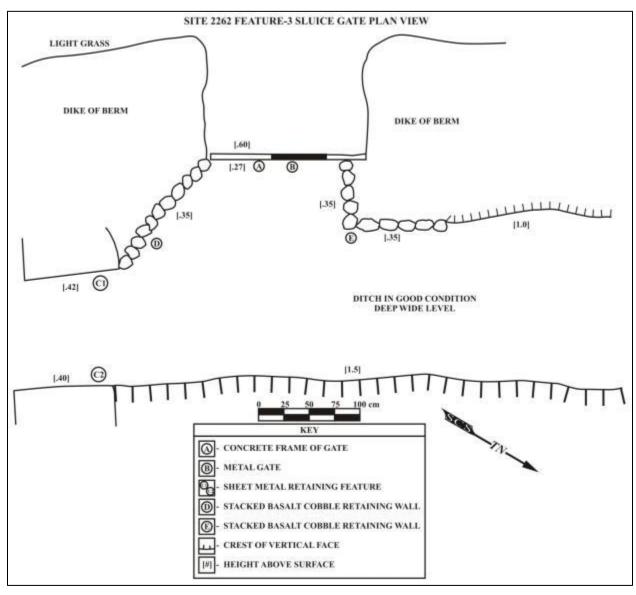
Plan view of Site -2262, Feature 3 retaining walls.
